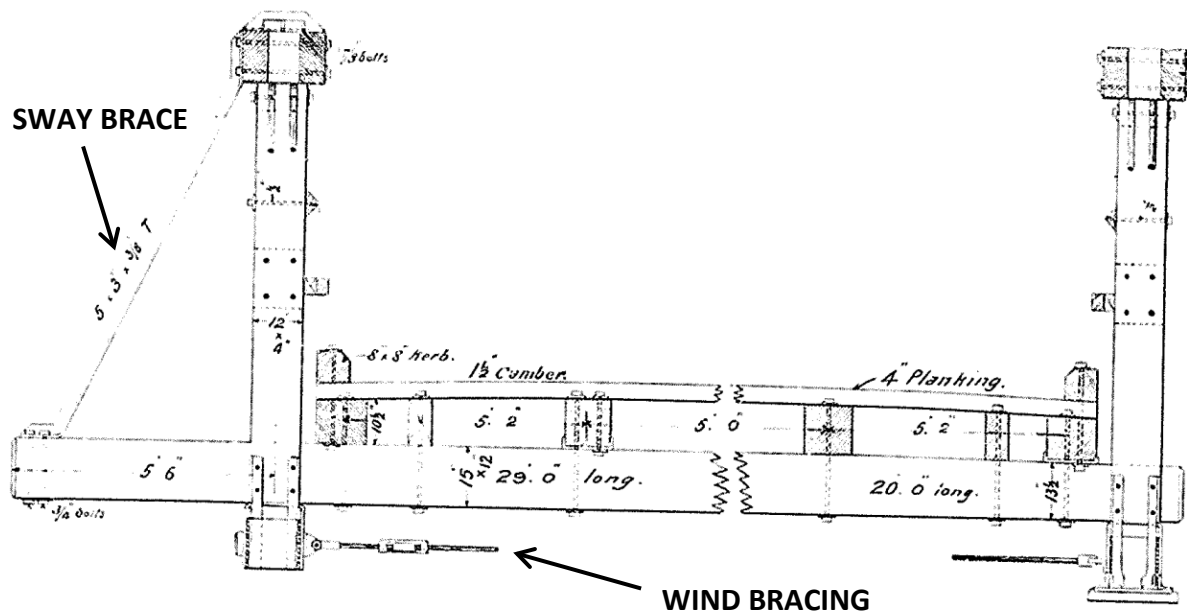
Original Drawings showing details for Sway Brace and Wind Bracing in 70' de Burgh Truss
